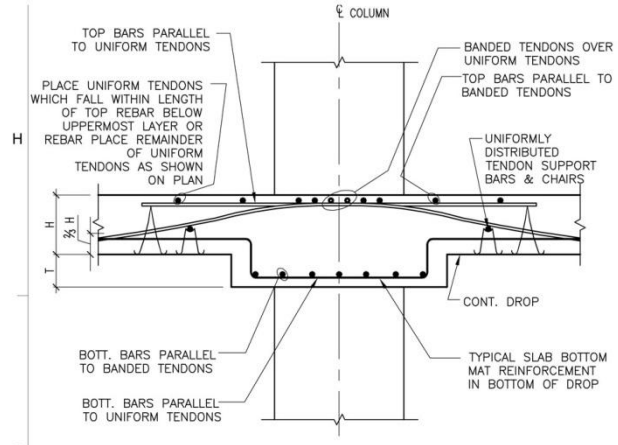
Section through shallow beam and column showing pre stressing tendon configuration
